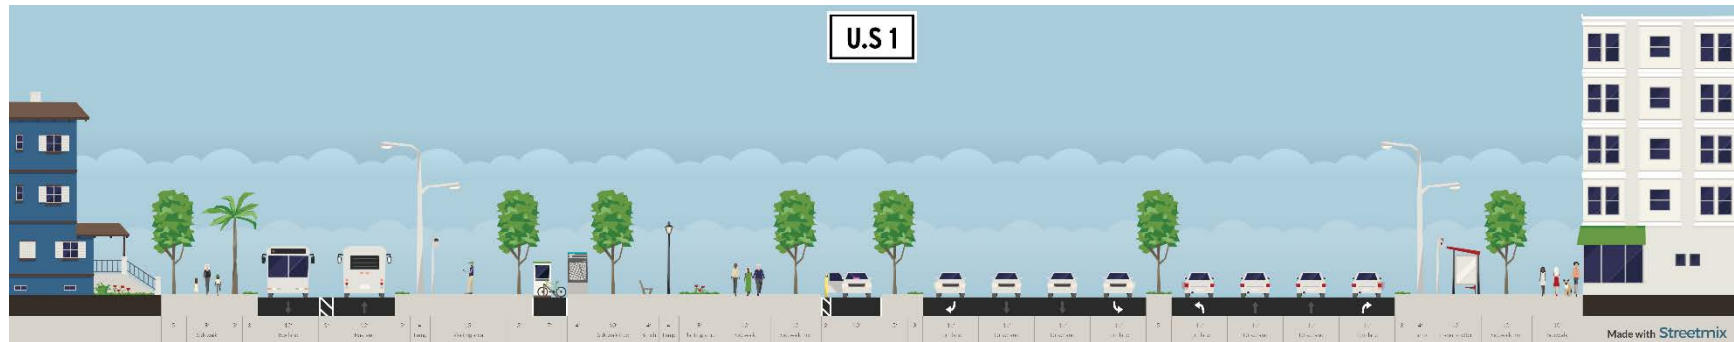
Proposed Street Section of Transitway & U.S. 1 / South Dixie Highway
